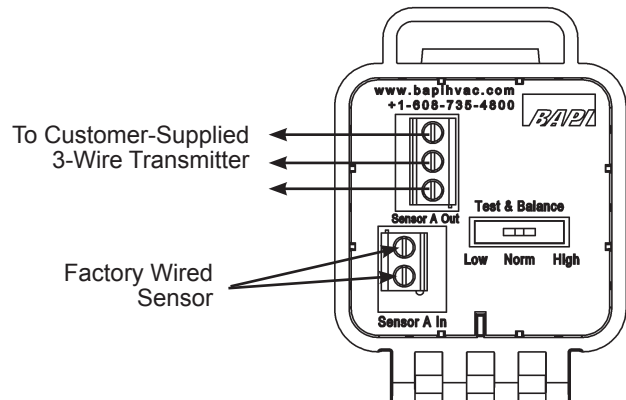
Terminal Strip (-TS) or Test and Balance (-TB) Option for 3 Wire Sensors
